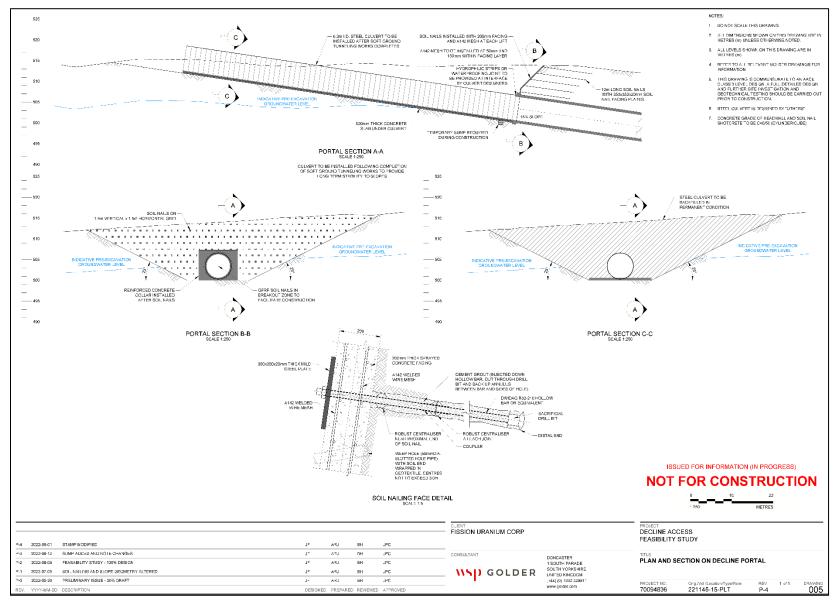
Plan and Section of Surface Decline Box cut and Headwall Portal Design
